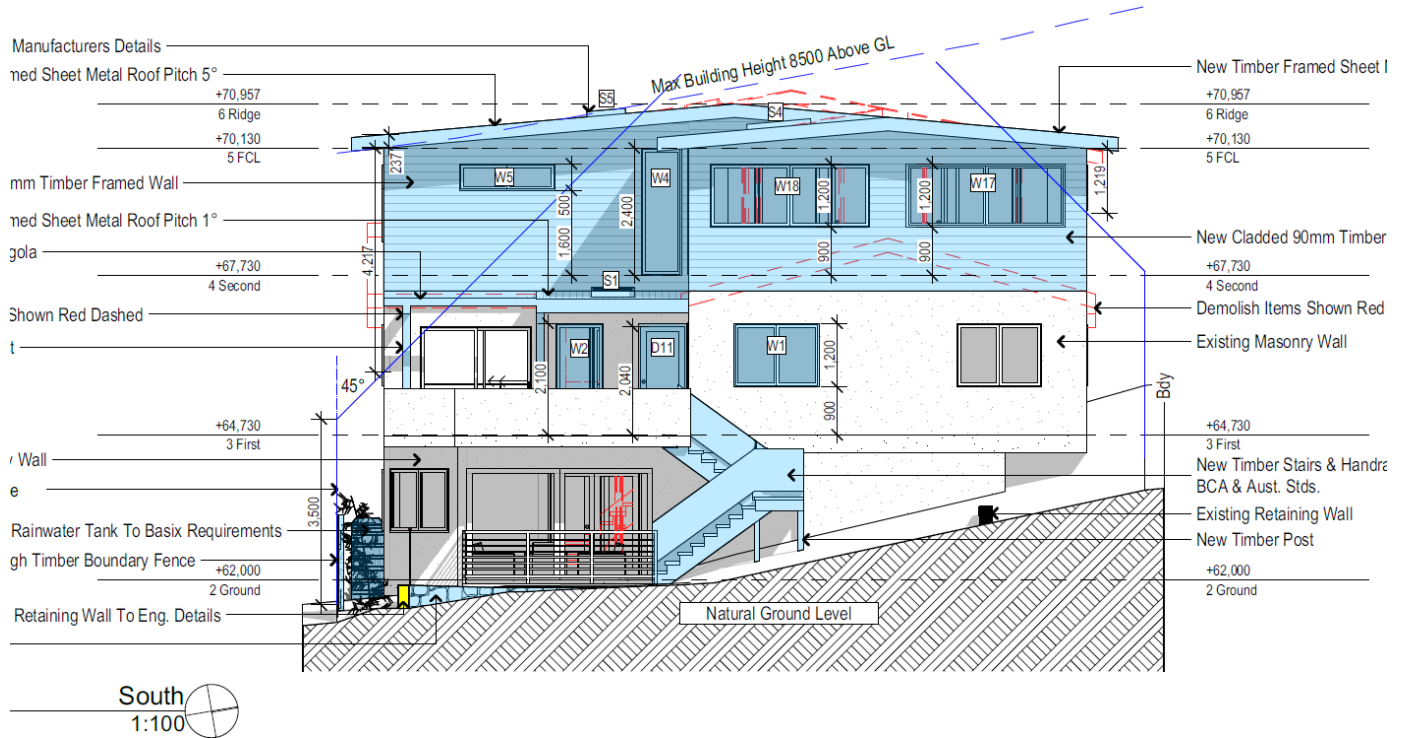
View of area breaching maximum building height control as noted in South Elevation prepared by Rapid Plans
